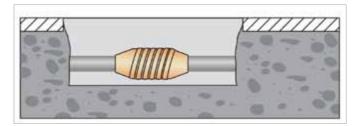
installation of RAUTITAN system within concrete/screed floor with corrosion protection system
